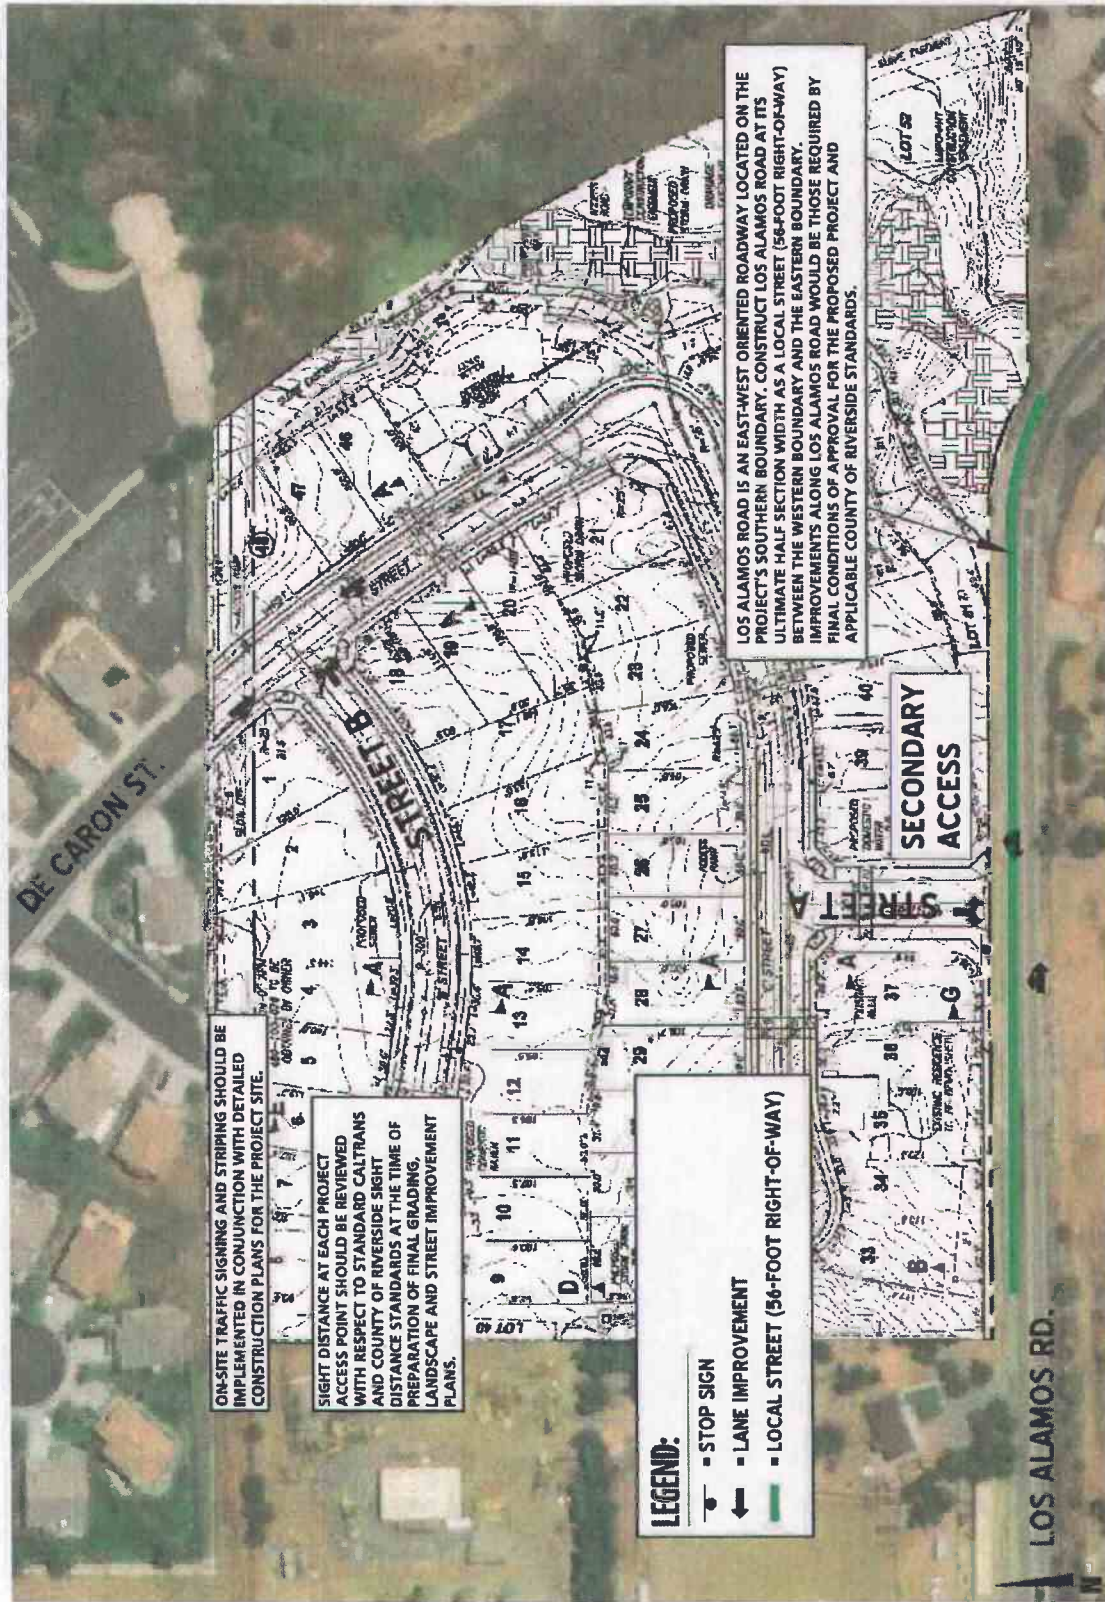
OPTION 2 SITE ADJACENT ROADWAY AND SITE ACCESS RECOMMENDATIONS
